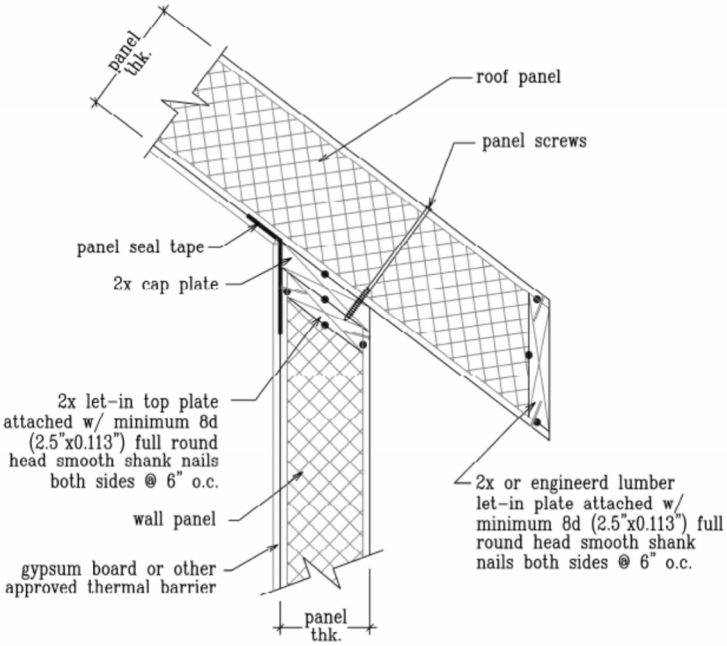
WALL PANEL TO ROOF PANEL WITH BEVELED TOP PLATE
